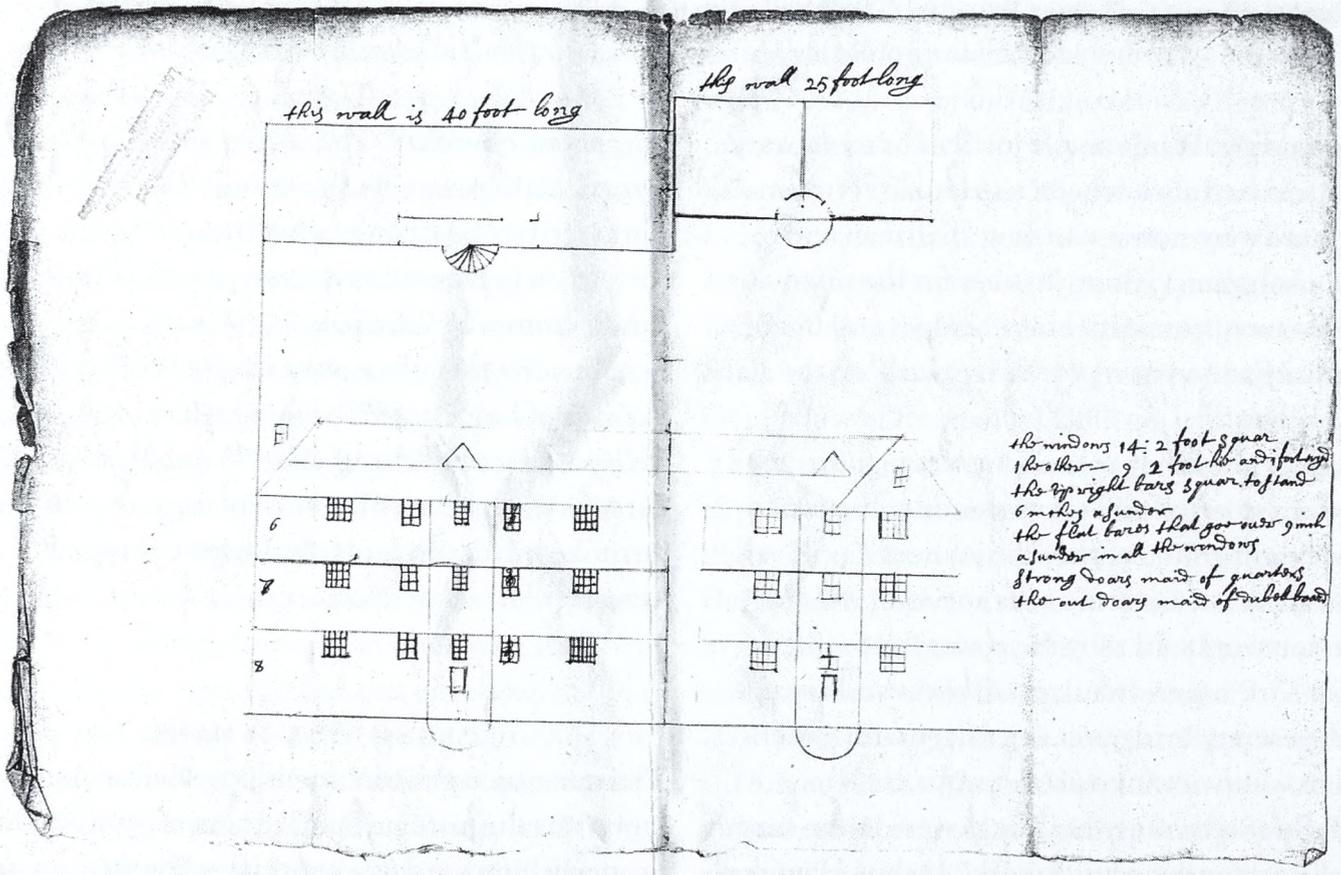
Plan and elevation of Leicester Gaol, 1686. *Leicester Record Office
